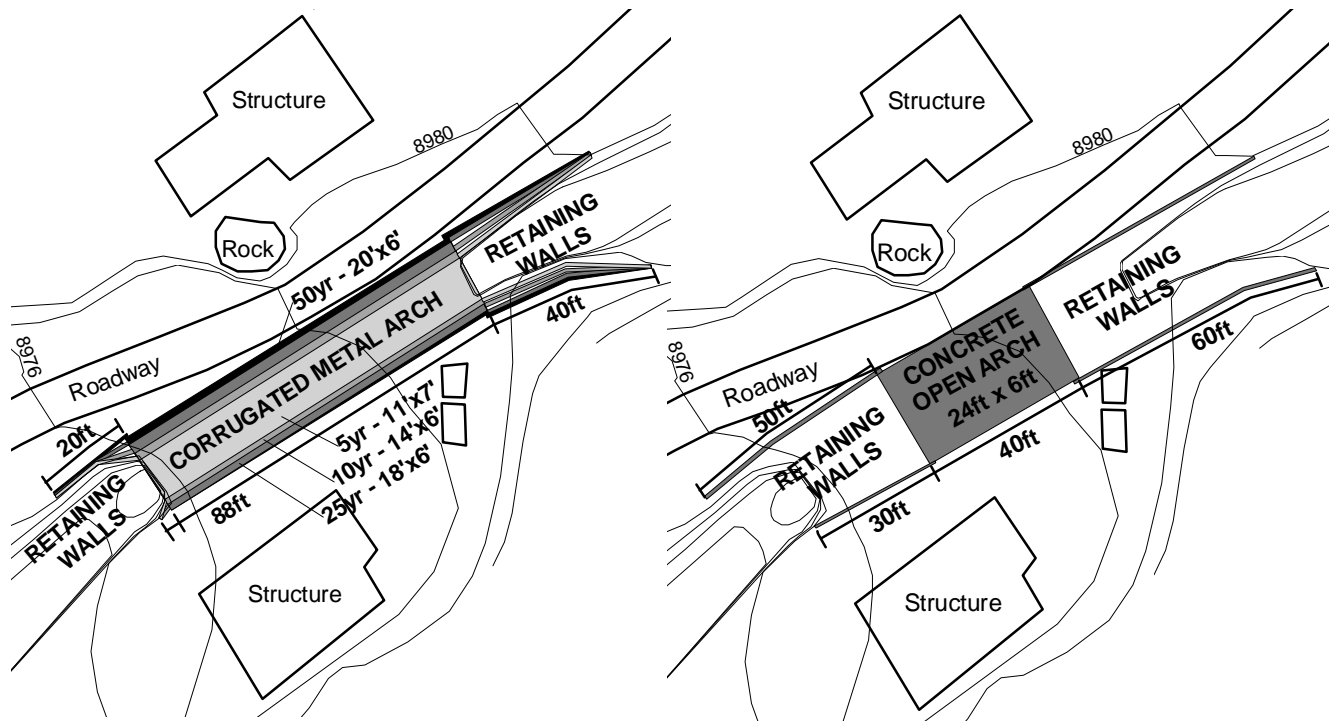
North Creede culvert replacement options, 5-50yr(left) and 100yr (right)
